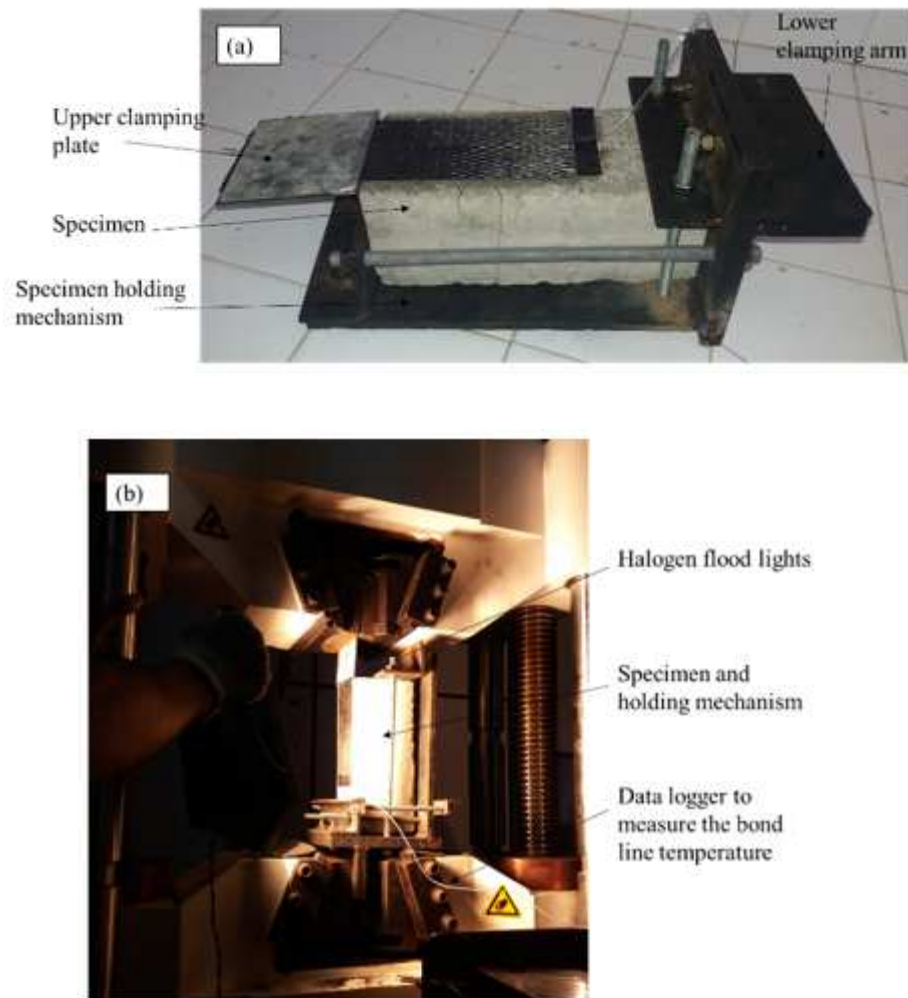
(a) Holding mechanism of specimen (b) Test setup
